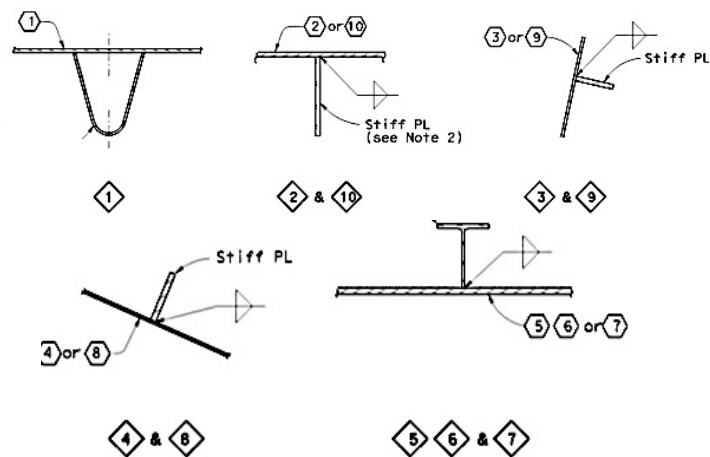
Stiffeners type for typical section of the Deck ("W" Line) [Ref.: Caltrans official project drawings 627/1204].
